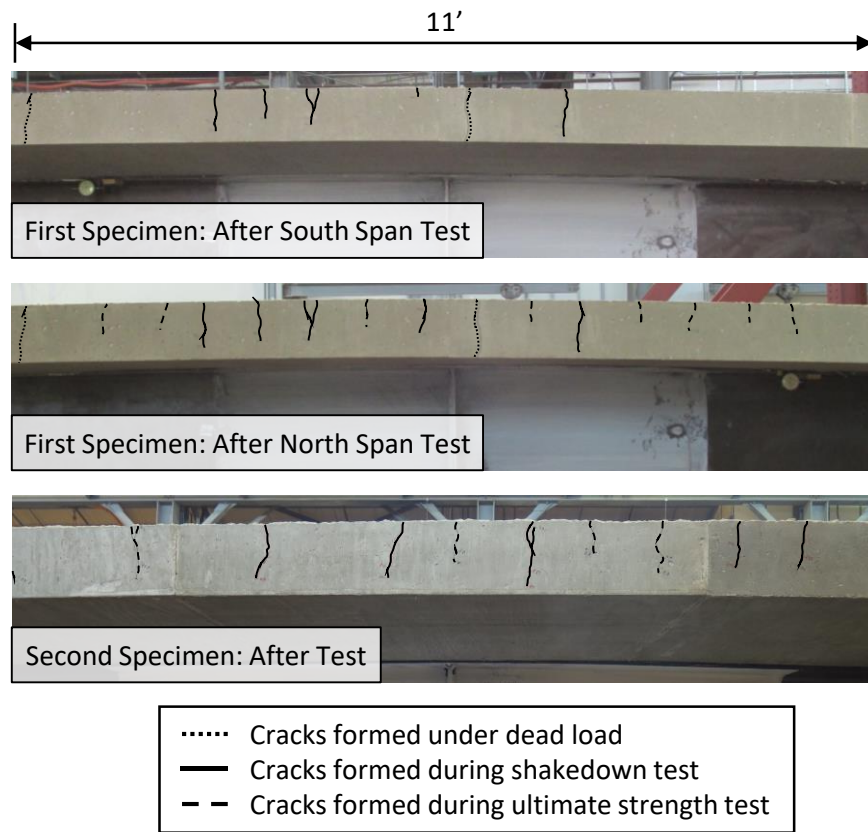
Photographs of Deck Cracking at Interior Support after Ultimate Strength Testing
